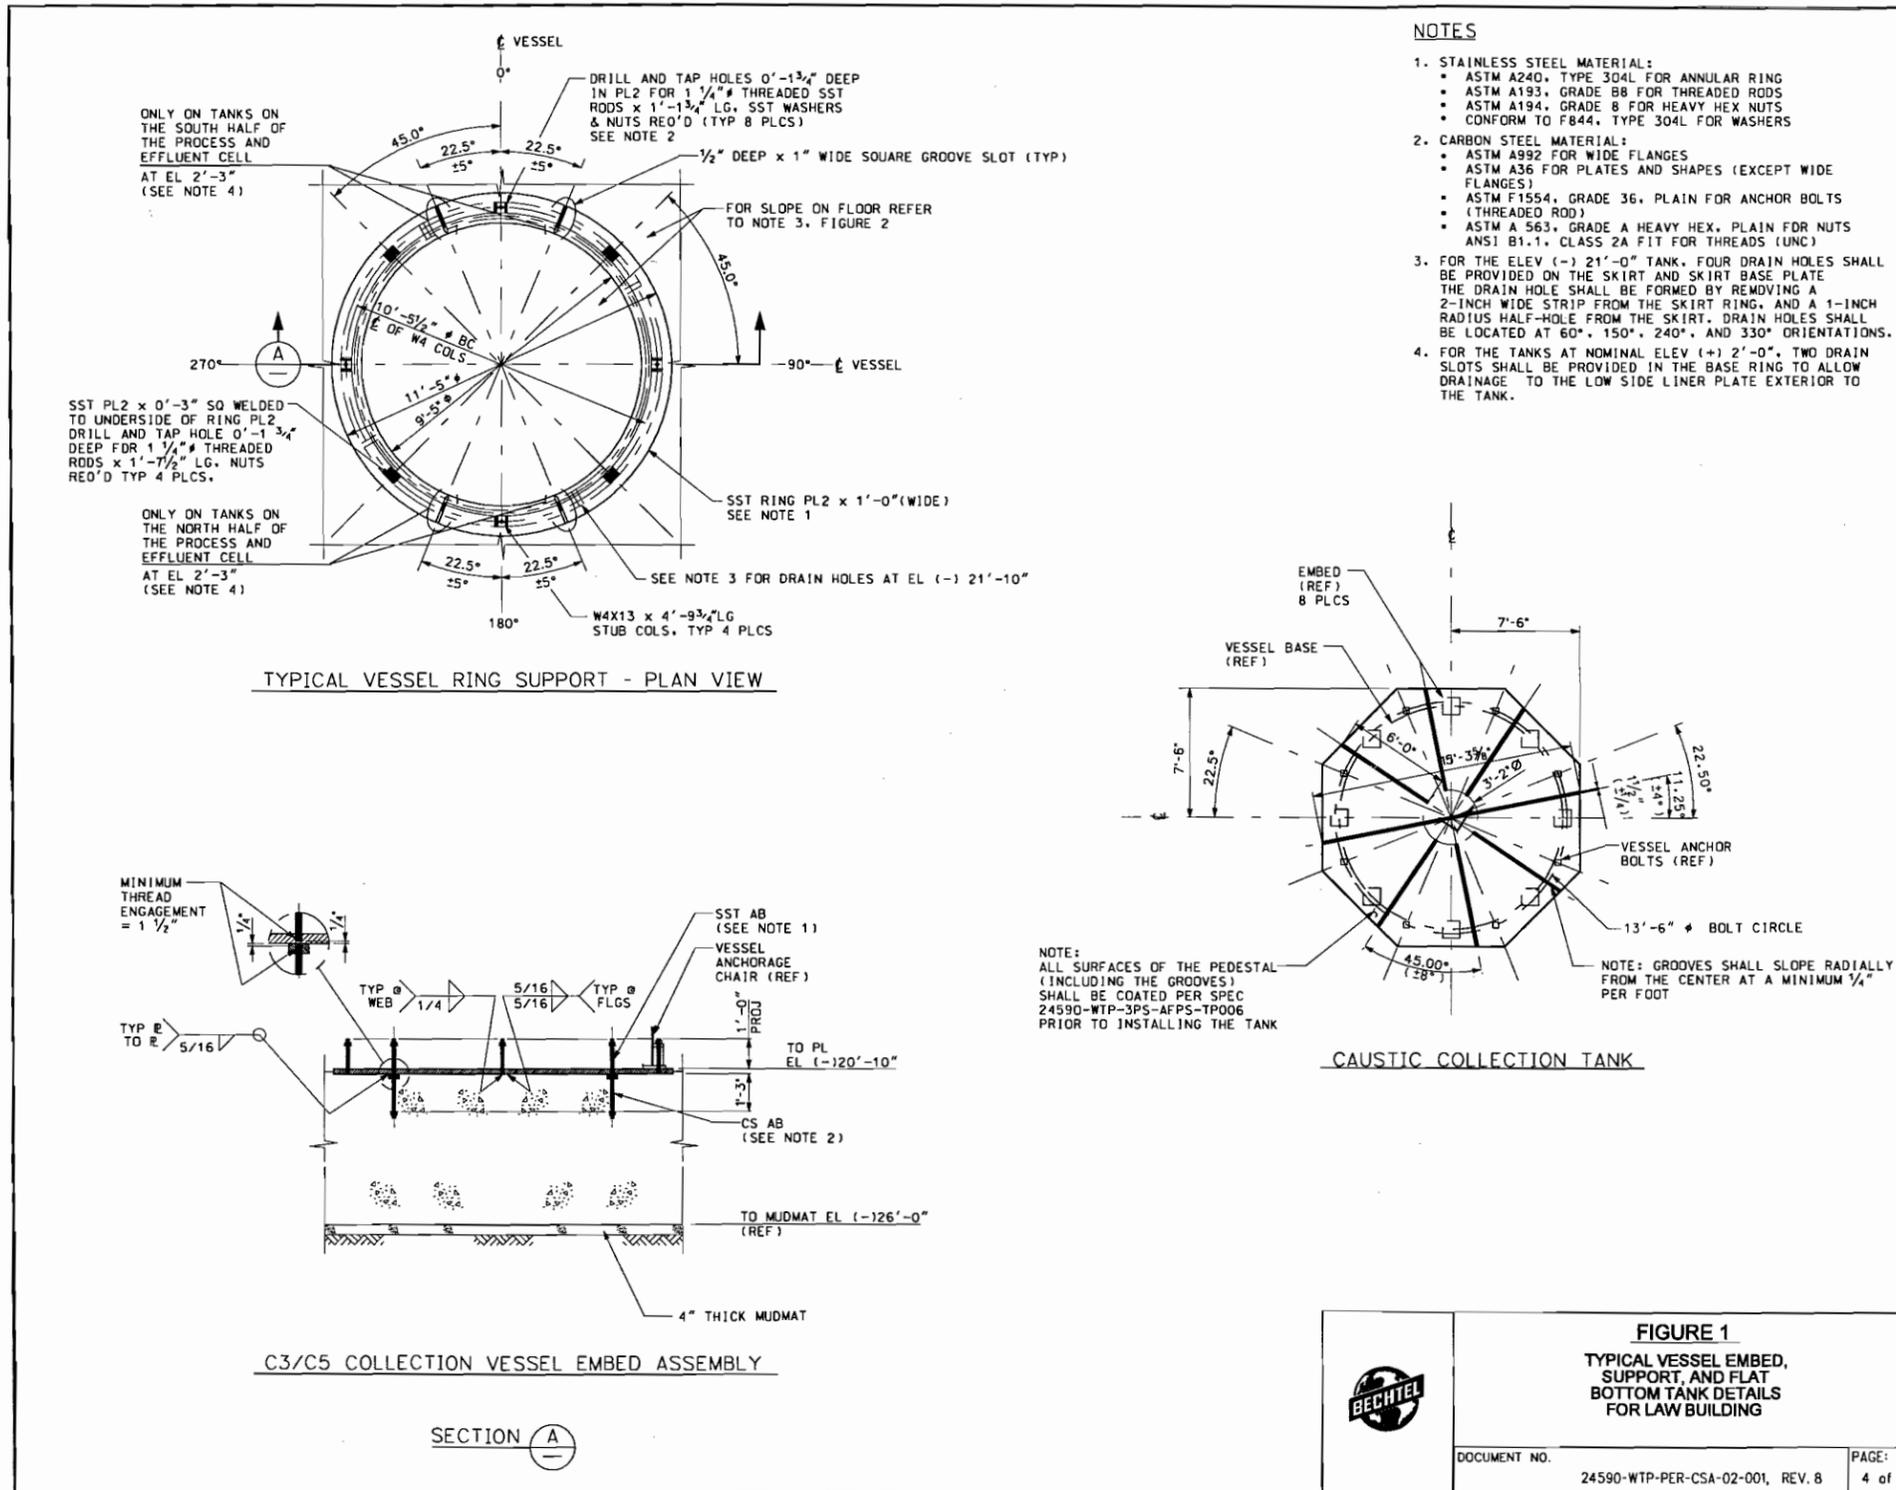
TYPICAL VESSEL EMBED, SUPPORT, AND FLAT BOTTOM TANK DETAILS FOR LAW BUILDING
